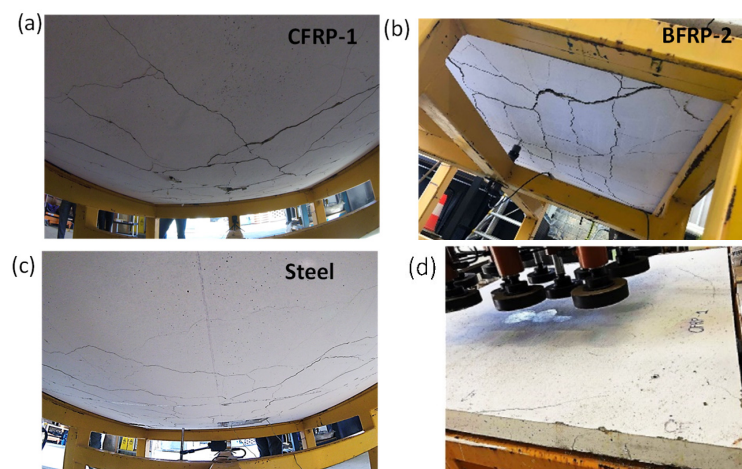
Failures of concrete slabs reinforced with (a) CFRP, (b) BFRP, (c) steel rebars, and (d) punching shear failure.
